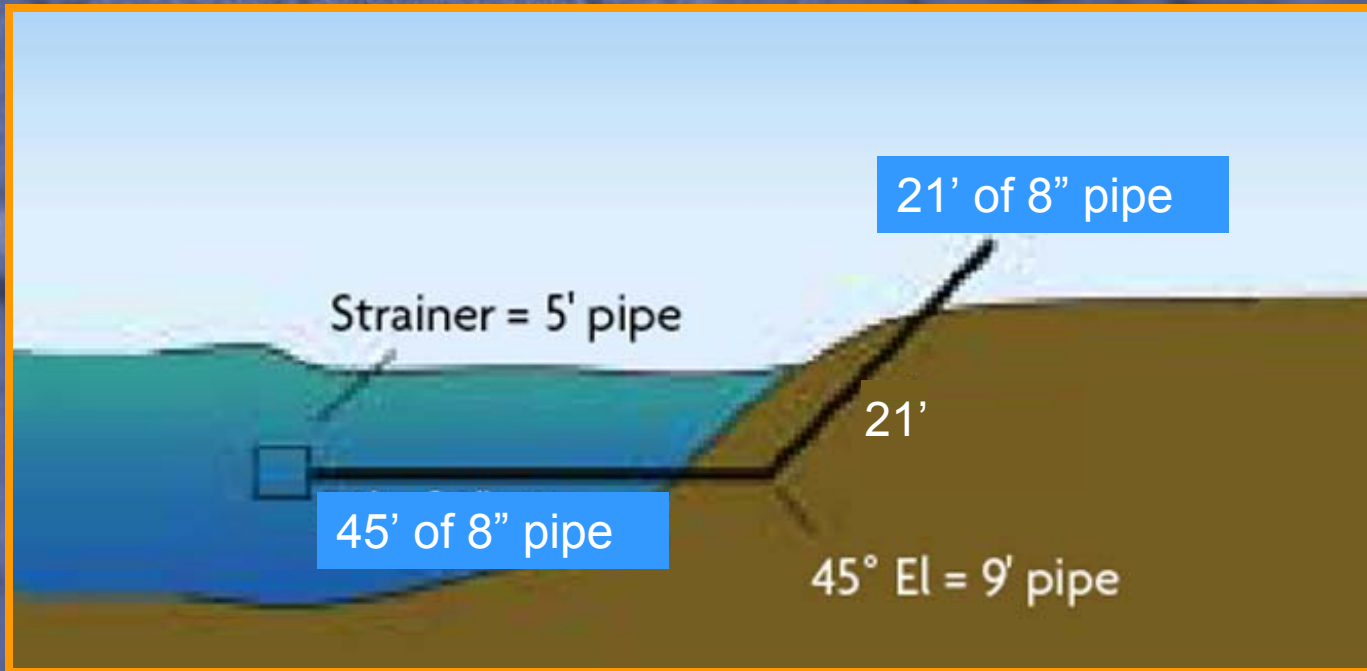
This sketch shows an improved dry hydrant piping arrangement. It replaces 6" pipe with 8" pipe, and the two 90° elbows with one 45° elbow.
